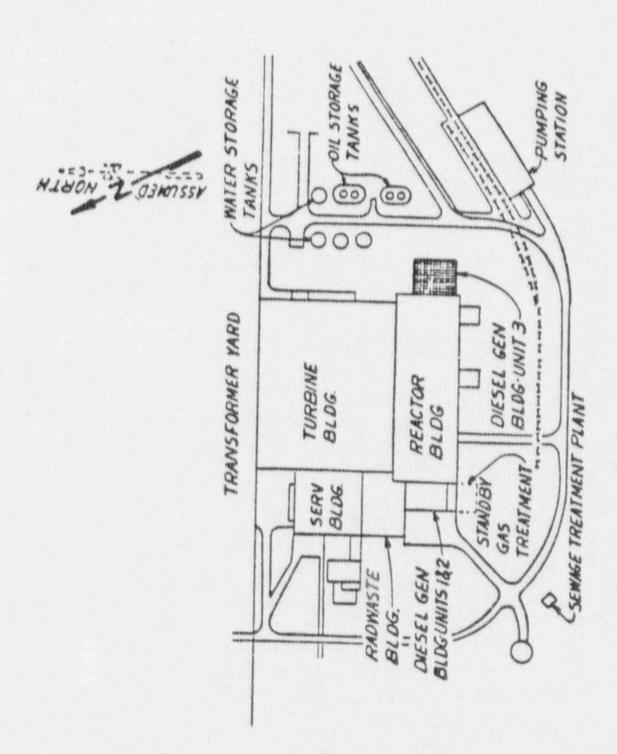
General Arrangement of Major Buildings at the Browns Ferry Site
